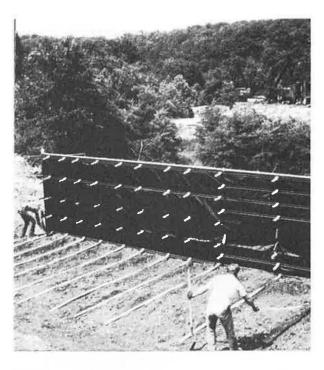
ATTACHING REINFORCING STRIPS, TEST WALL NO. 3
